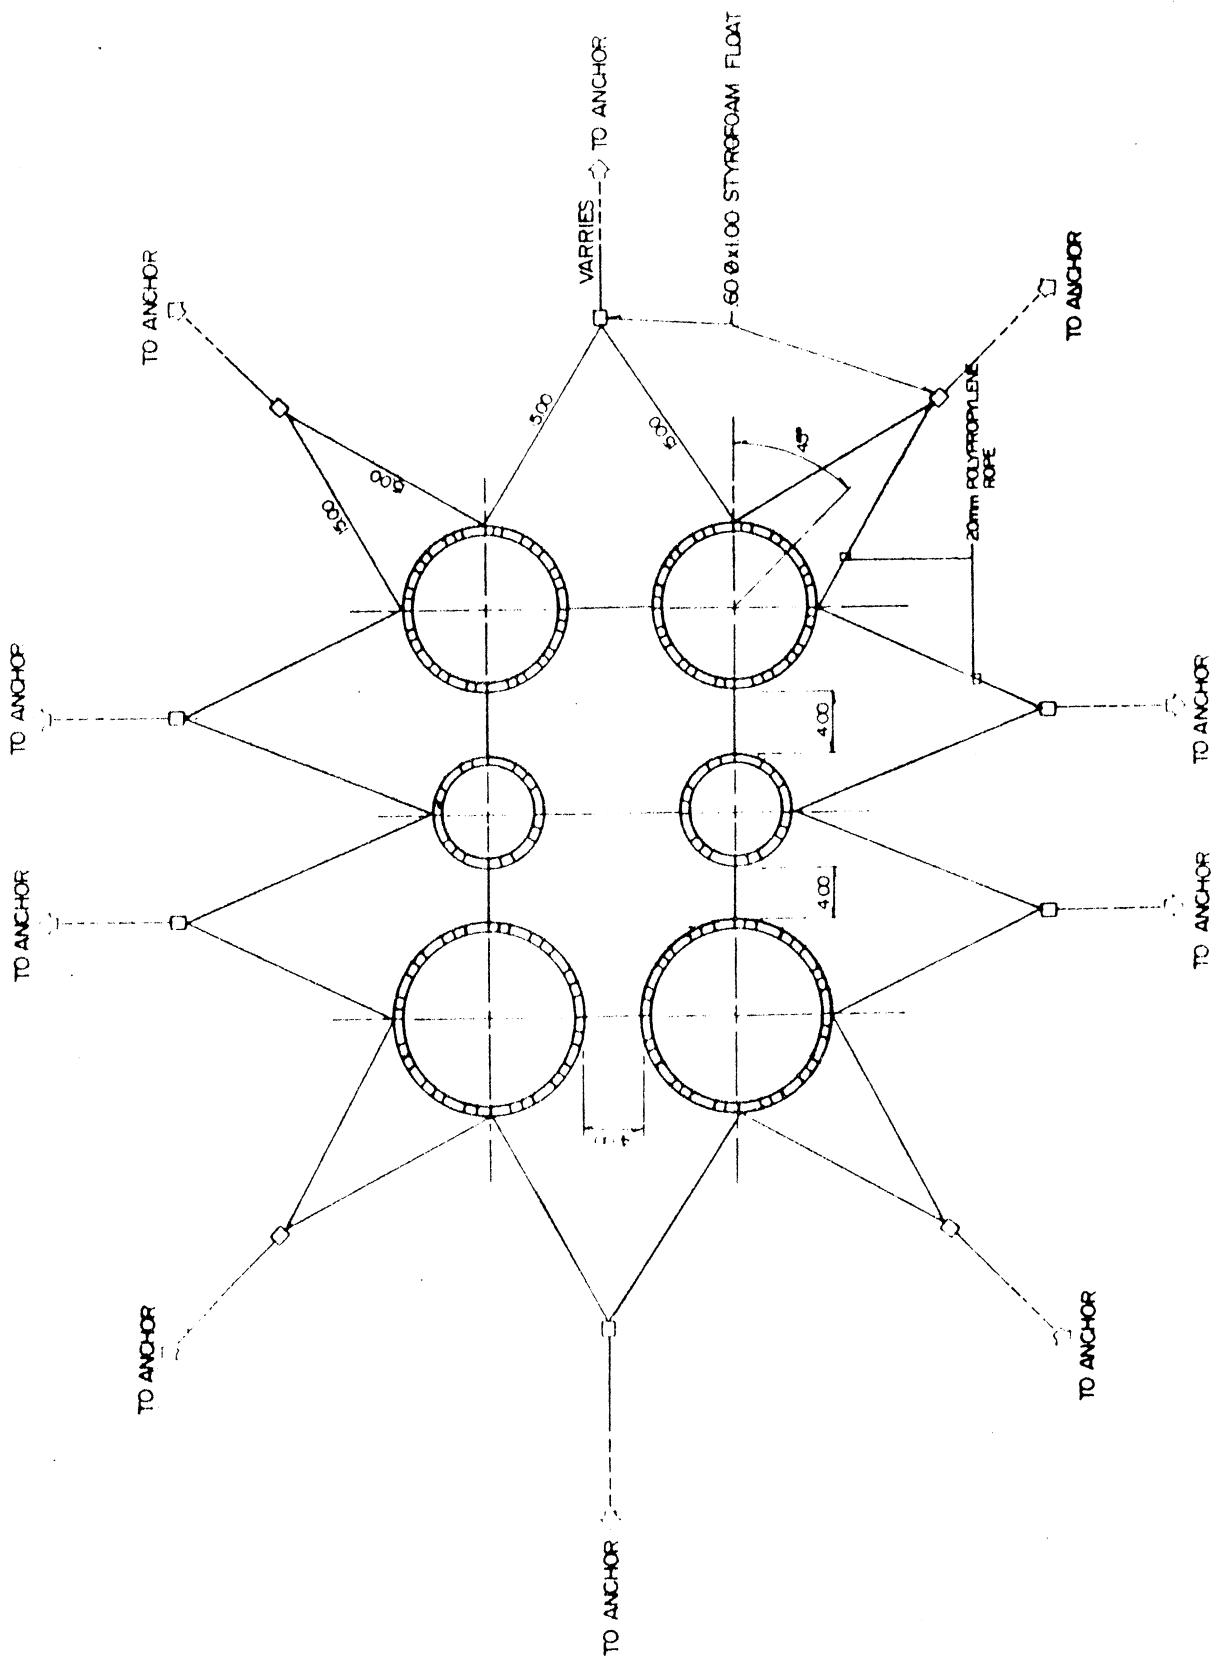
LAYOUT OF 6-units FLOATING CAGES
